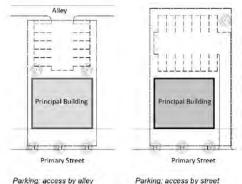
Parking Entrances Shall Not be Situated Adjacent to Primary Streets
